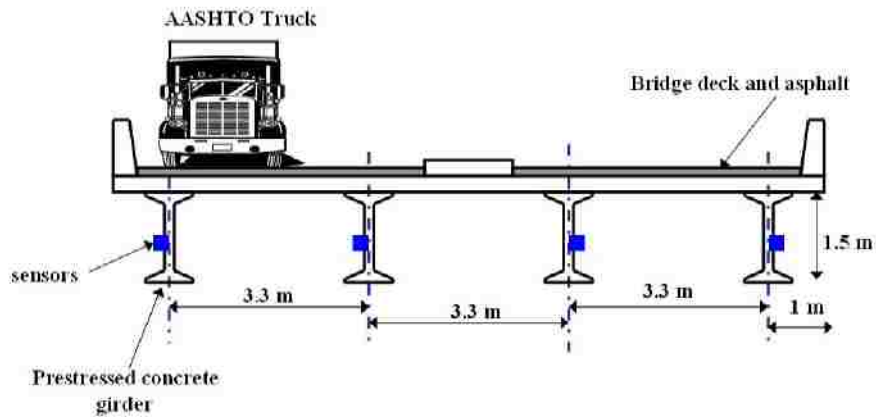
Cross section of the prestressed concrete bridge with the location of accelerometers and traffic lanes.
